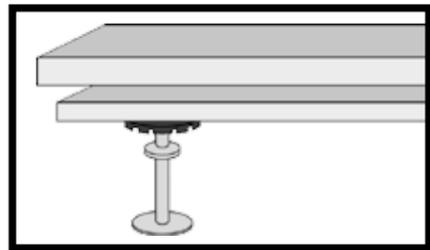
This system consists of gypsum fibreboard panels resting on steel supports with an adjustable height. When preparing this system, strictly follow the manufacturer's instructions. Make sure that the points of contact between support and slab are filled with adhesive. This will ensure a support without cracks. After installing the system, make sure that the support on which the slabs will be laid has the features described in paragraph "4.1.1 - Supporting material: requirements". Application of a primer before the tile adhesive must be decided upon by the manufacturer of the adhesive you intend to use.
